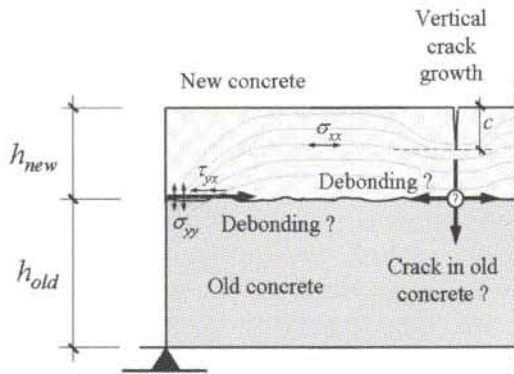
Composite system formed of a new concrete applied on an existing substrate, adapted after Bernard [7].
